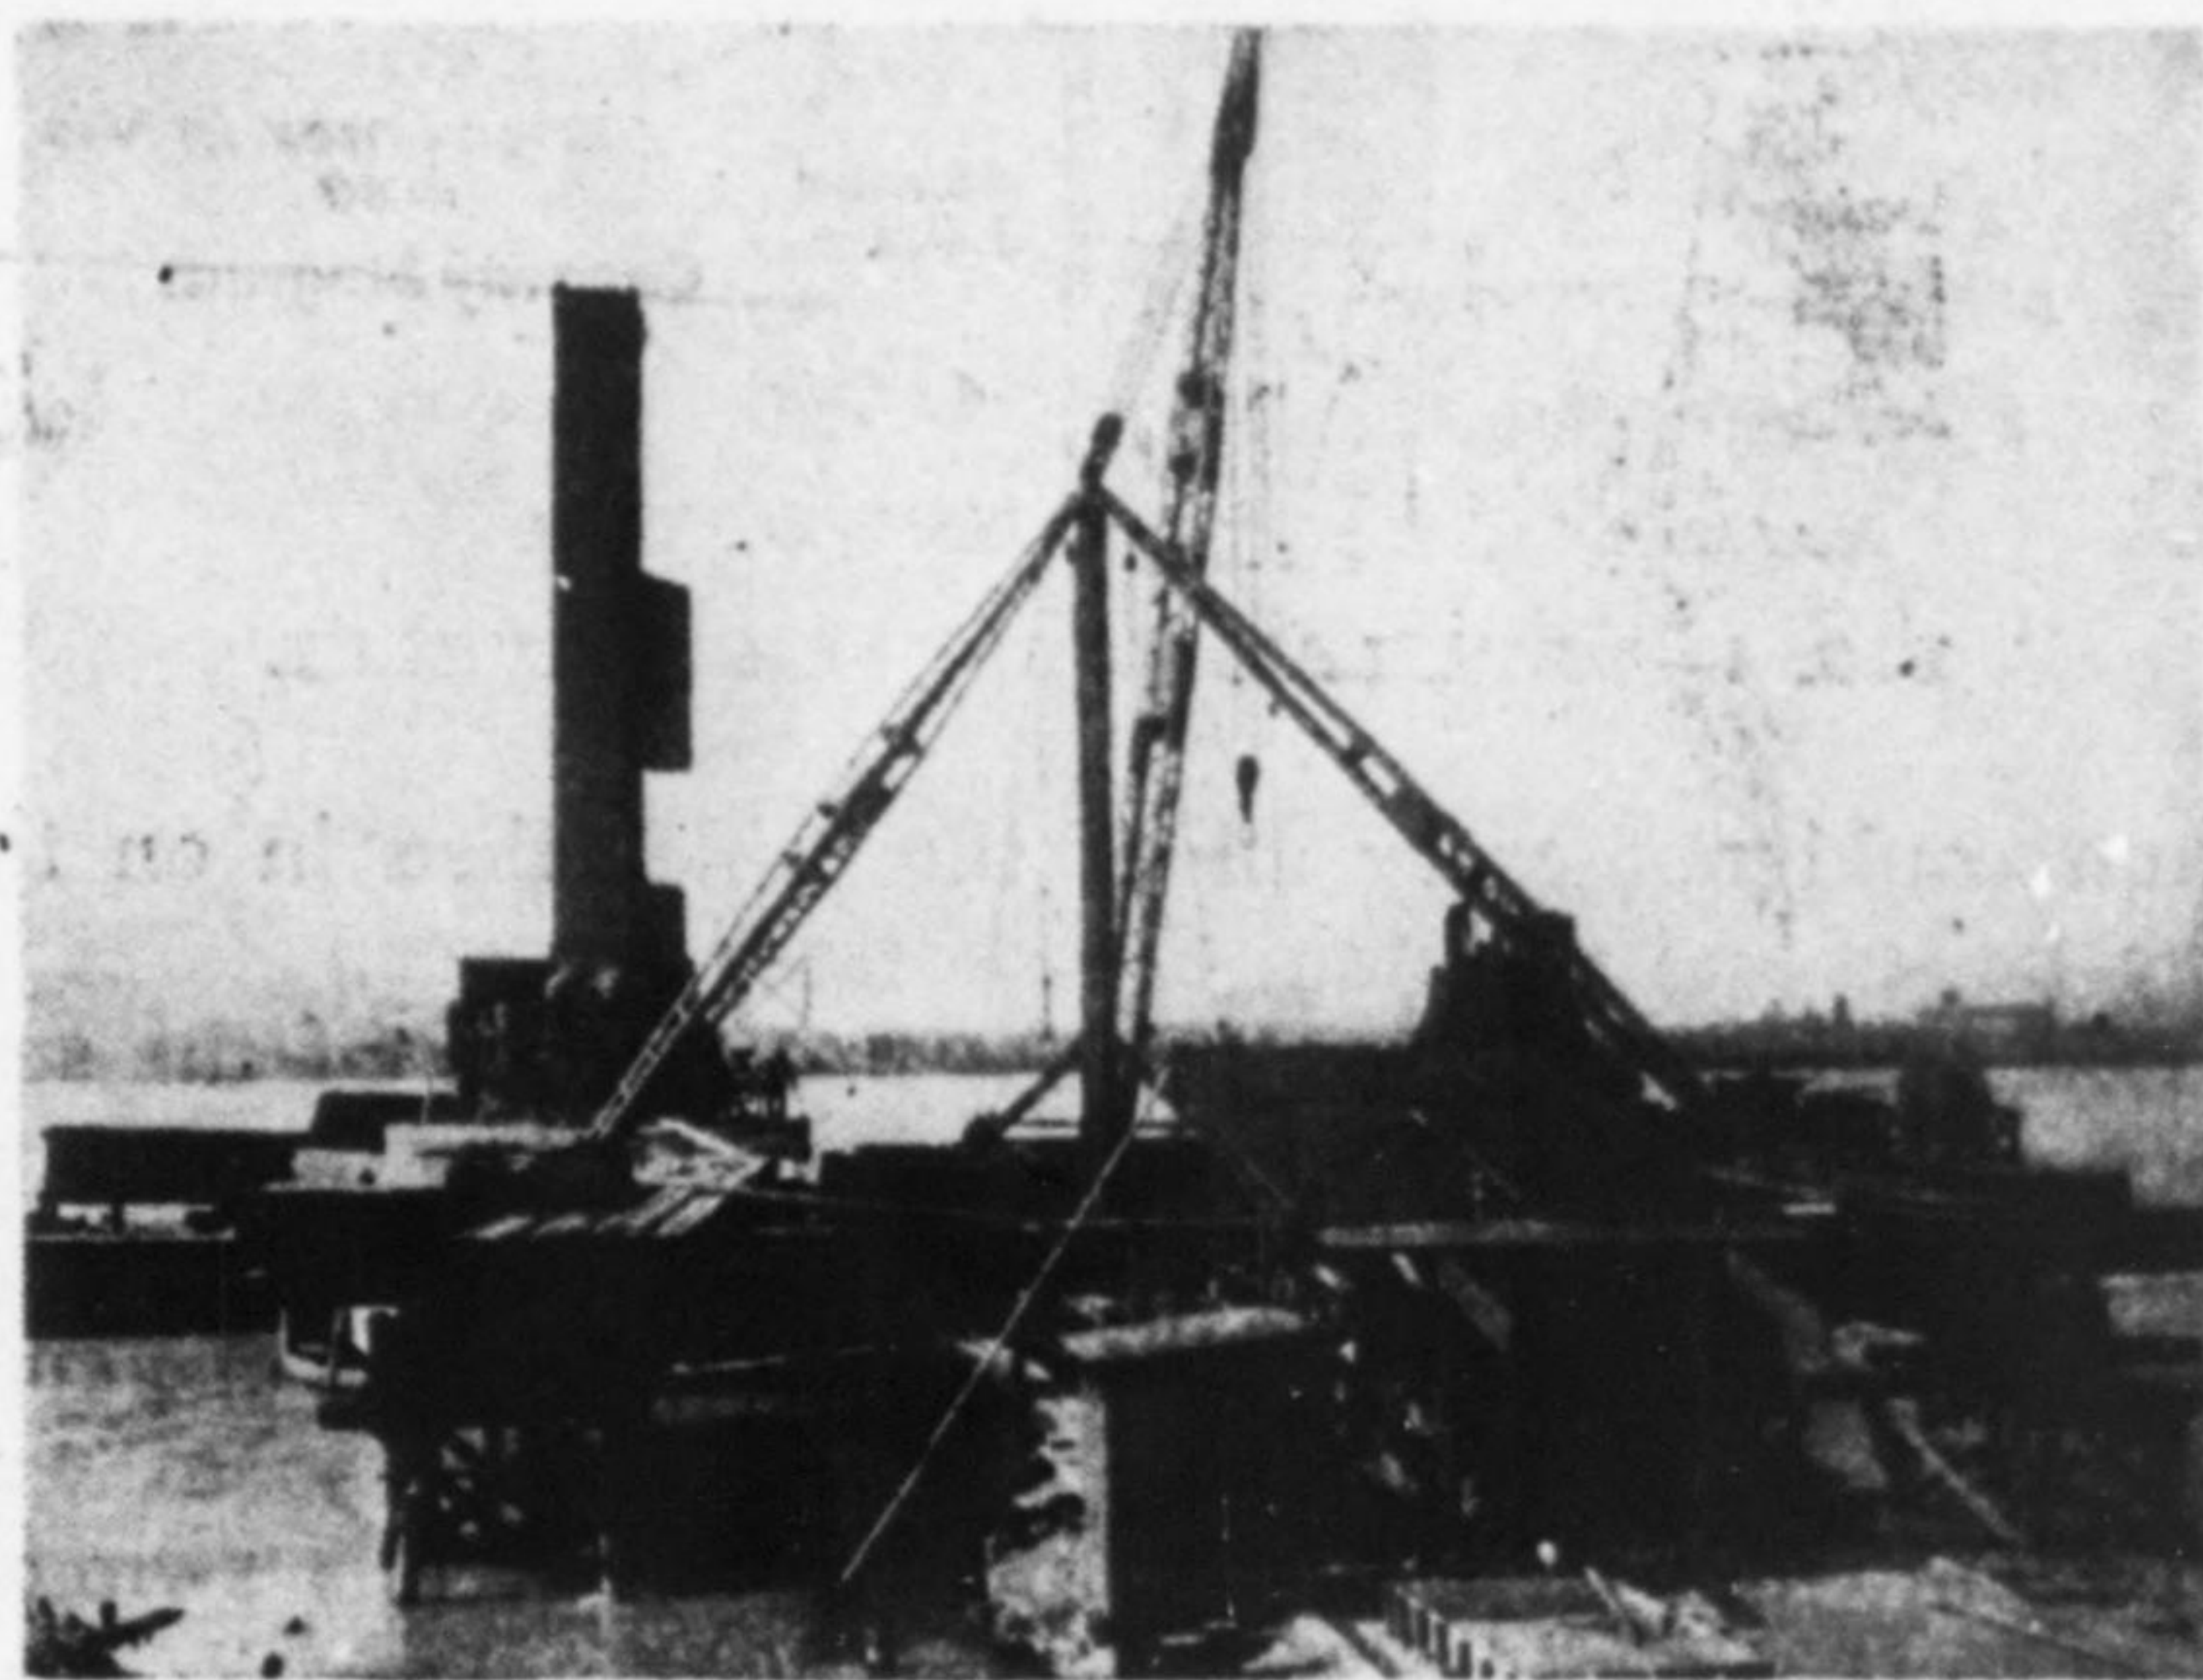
ERECTING FIRST LIFT OF CANADIAN TOWER
